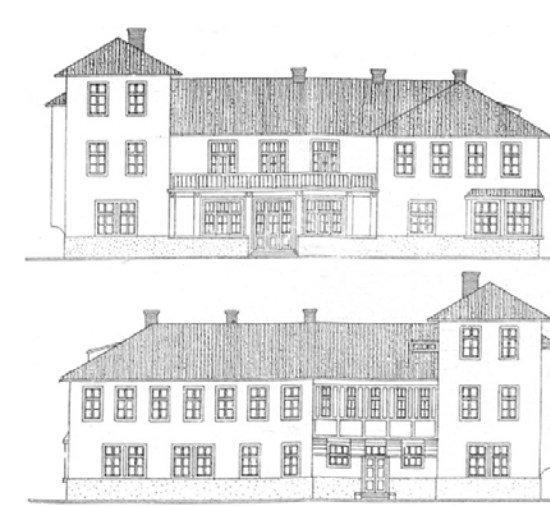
Invalid house; elevation views from south, garden side, and north, street side.
